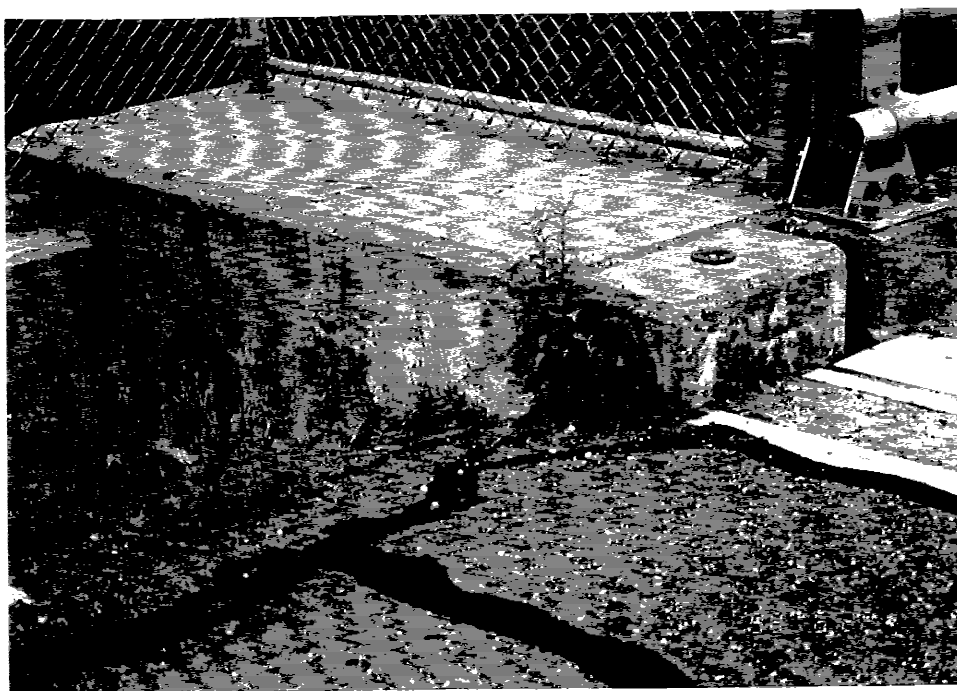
Cracks with efflorescence on the backside of the exposed south backwall adjacent to the drain and the east approach.
